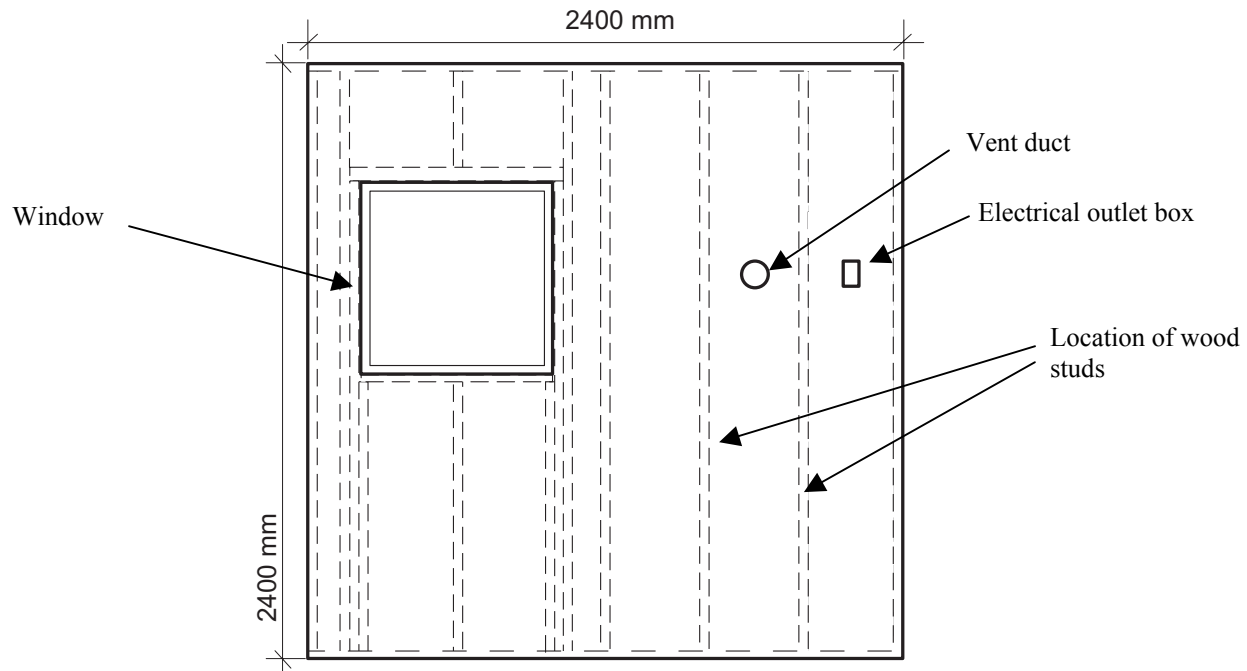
Schematic of a typical wall test specimen for the DWTF. The elevation shows the basic wall construction minus the wall cladding as well as the positions of the penetrations.
